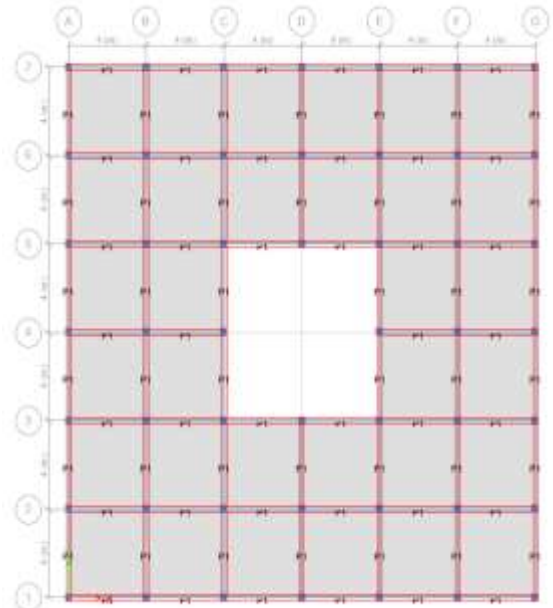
Arrangement of pier labels at the centre discontinuity building
